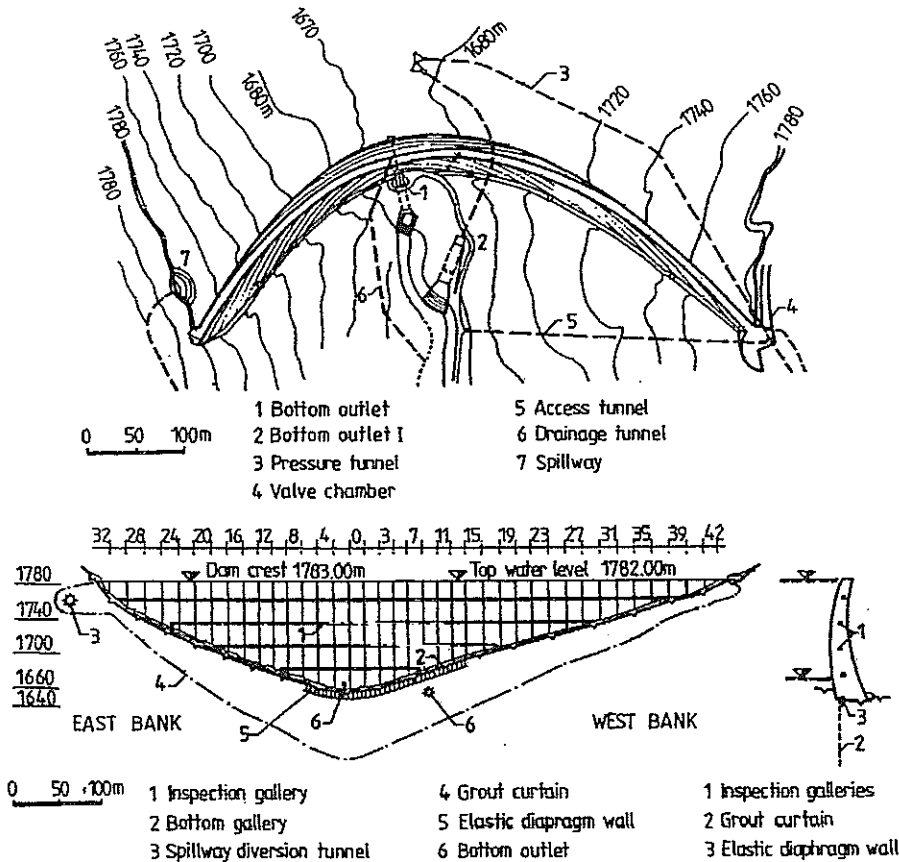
Schlegeis dam: a - layout, b - central and longitudinal sections.
